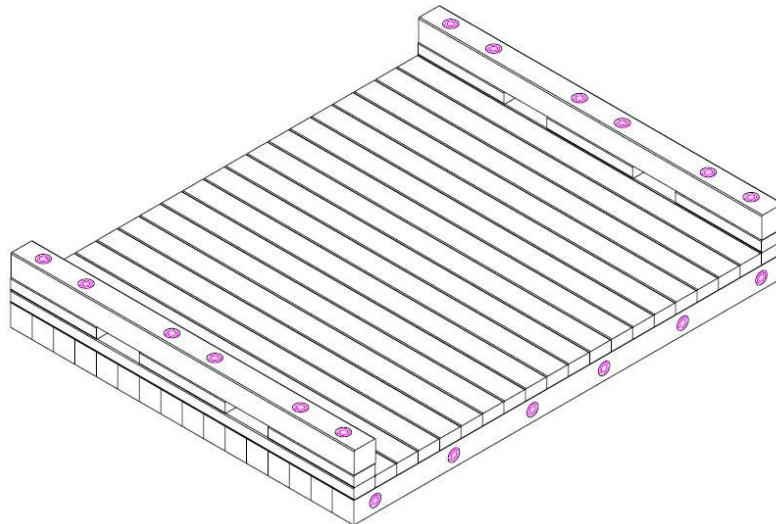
STM - Structural Timber Mat (shown with optional curb system)
